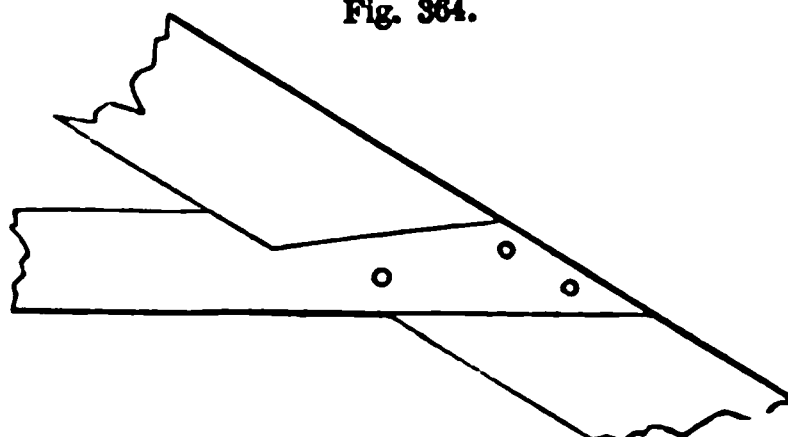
shows another form of joint. In all these joints trenails or bolts are used to secure the timber together.
